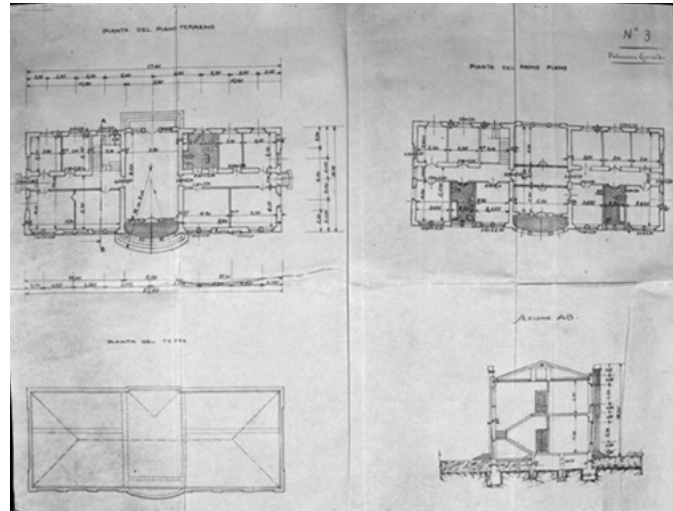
AEI management / main terminal building, plan, section and the roof drawings (BCA 2).
